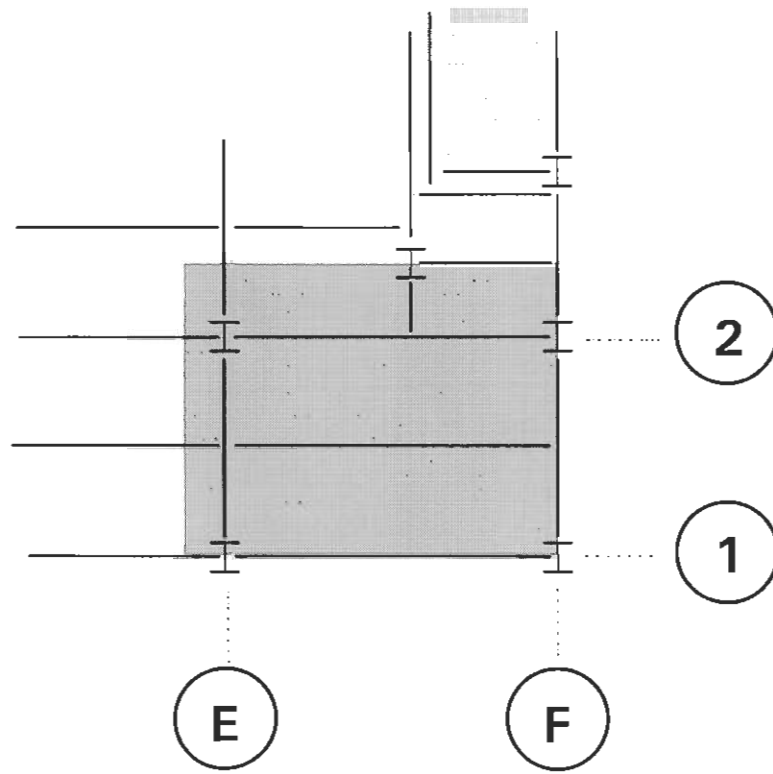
Bolt shear in beam-to-beam connections (fin-plates)
